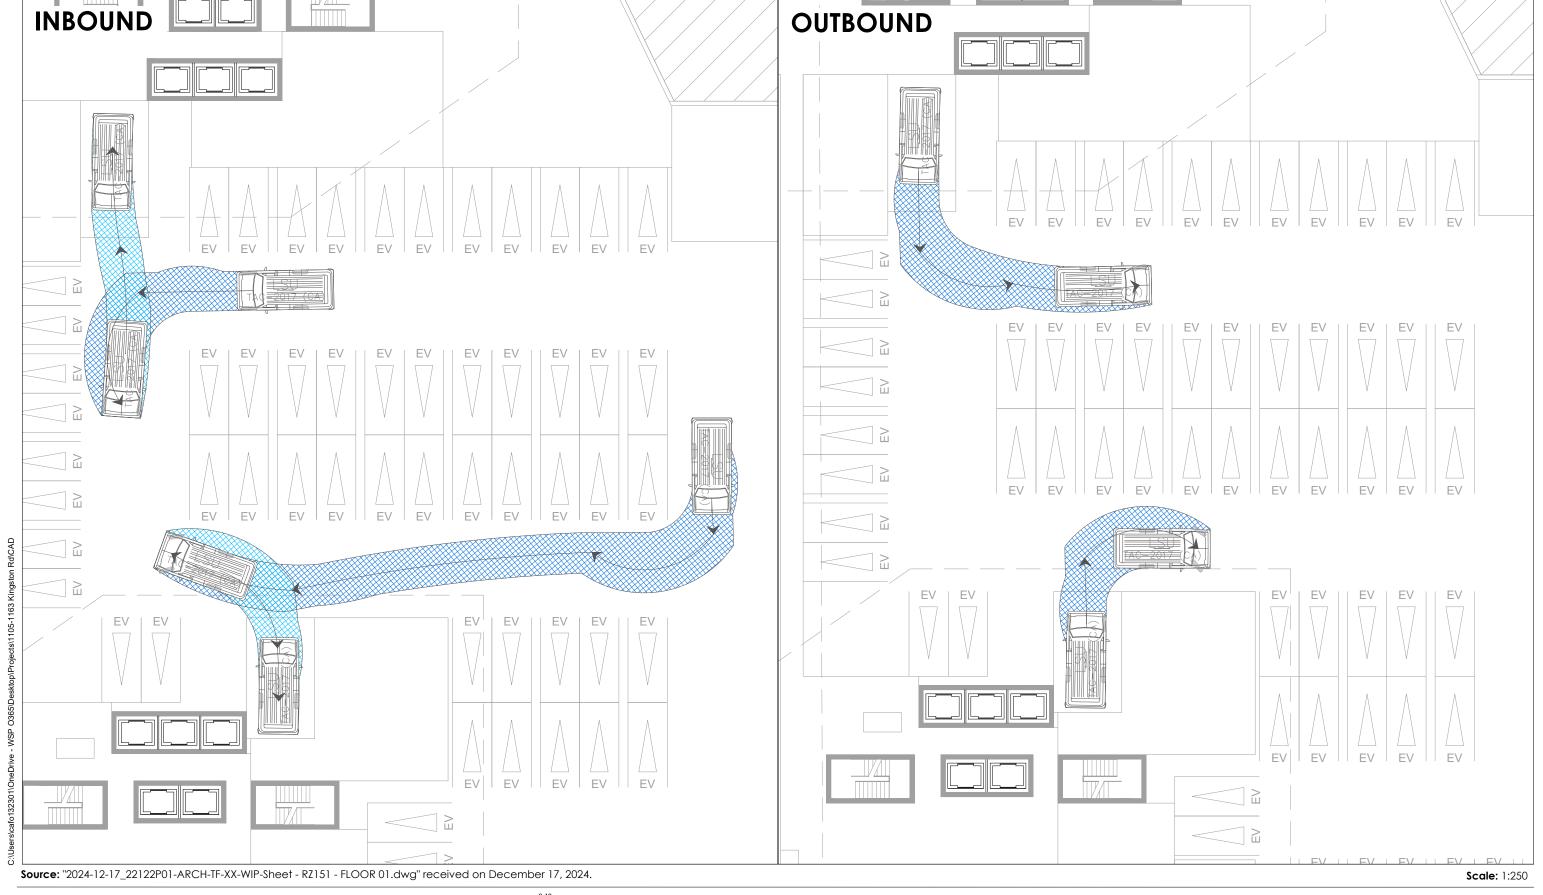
LSU Loading Truck Turning Maneuver - Building E - Loading Space 1 1105-1163 Kingston Road, Pickering
